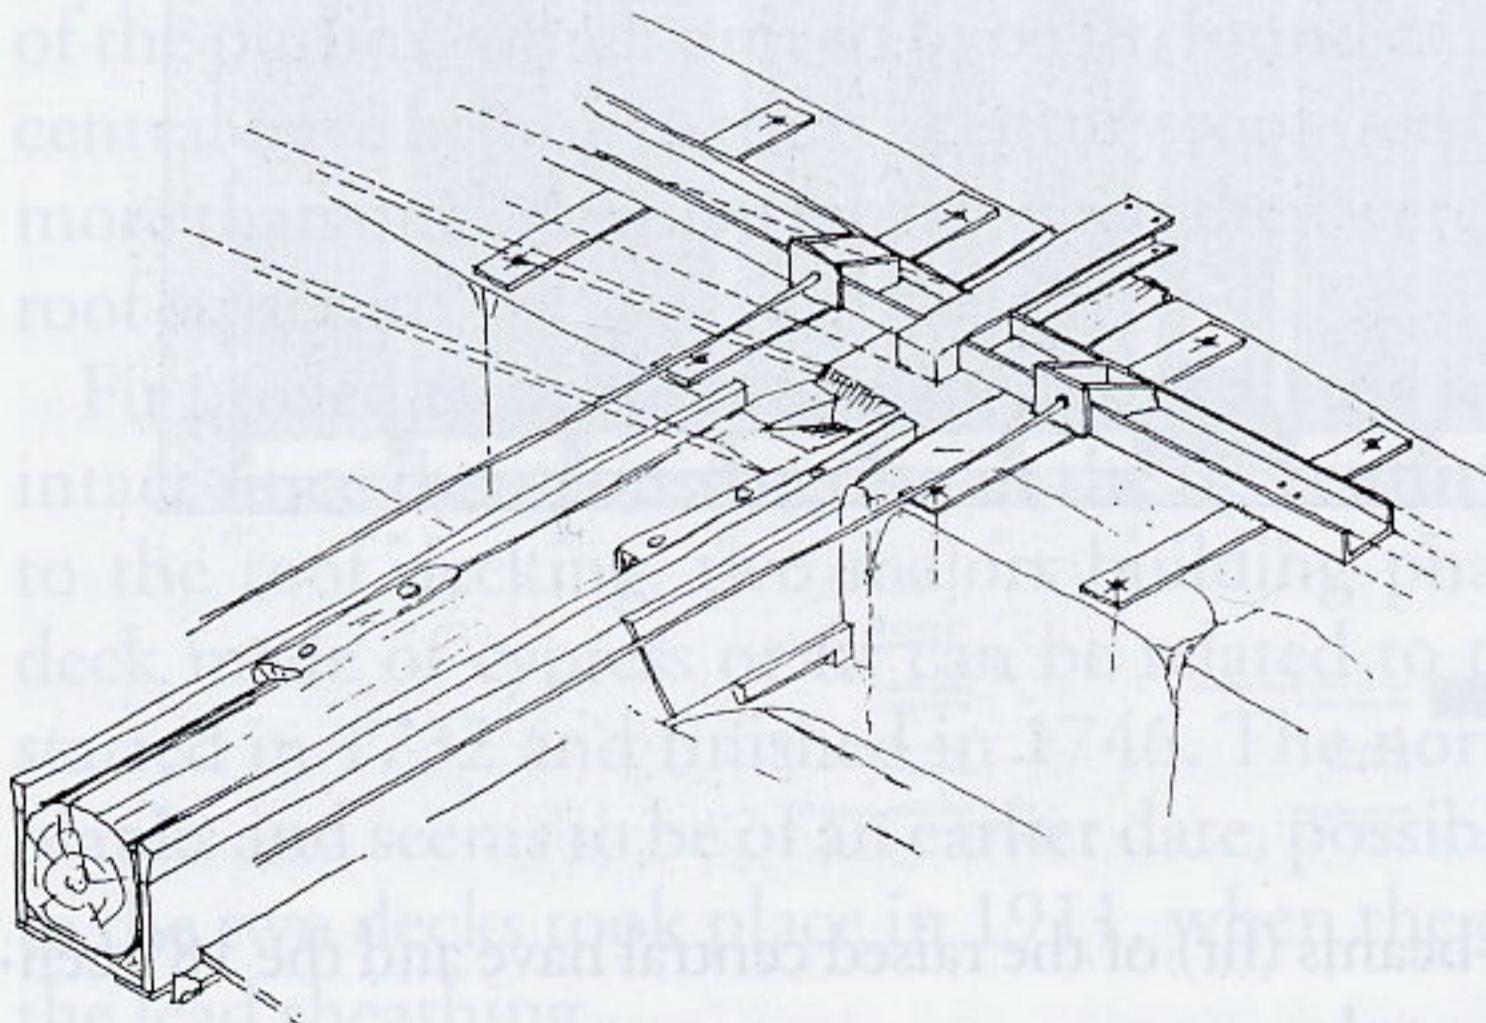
Isometric sketch drawing indicating the proposed stainless-steel frame resting on the lateral wall of the raised central nave.
